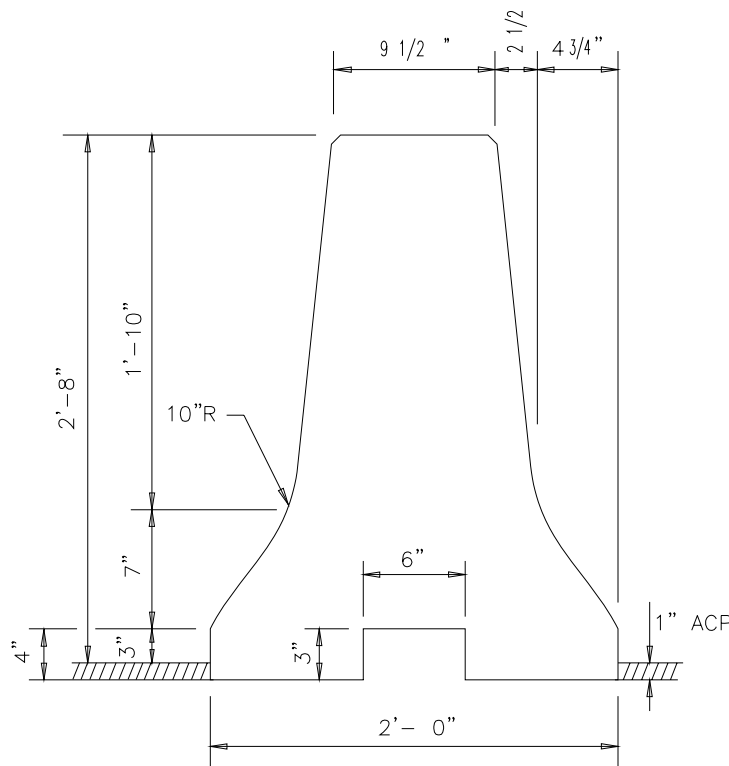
Typical Cross Section of F-Shape Concrete Safety Barrier.
